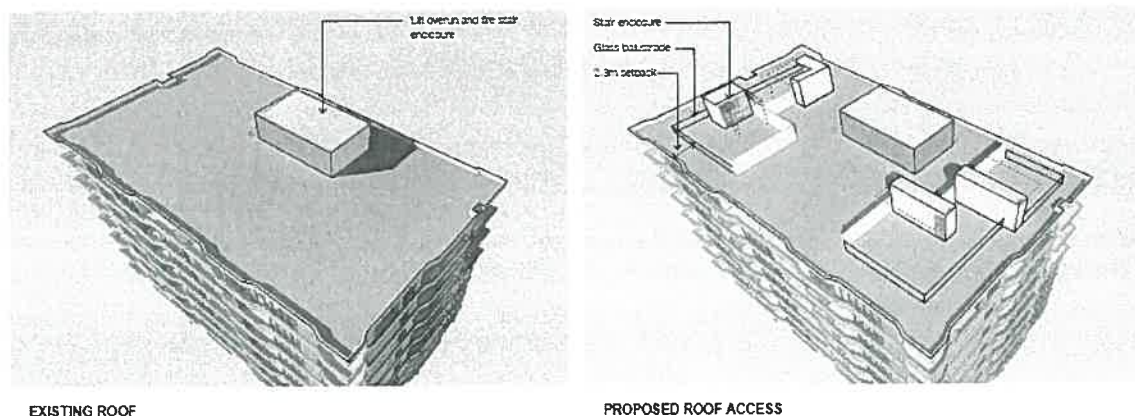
Plan showing (1) existing roof top plant and (2) additional roof top structures proposed
